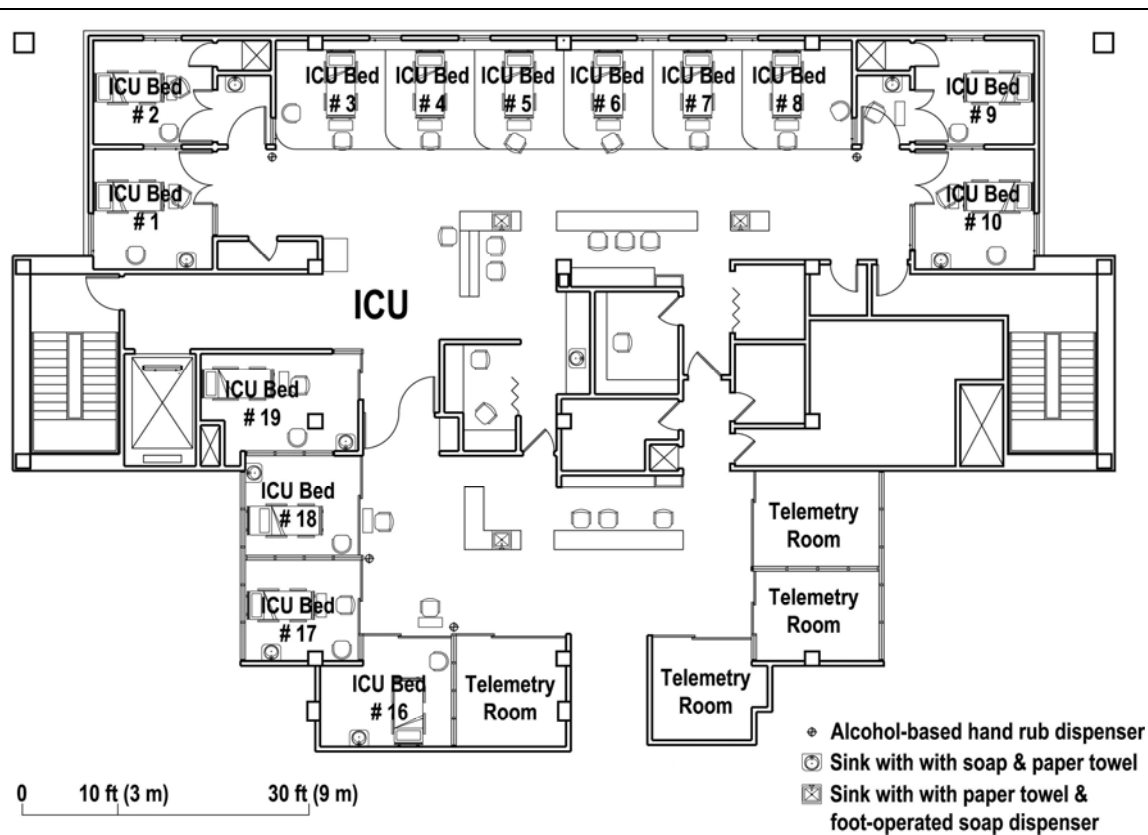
Layout of the Old ICU (adapted from architectural drawings provided by WHR)
